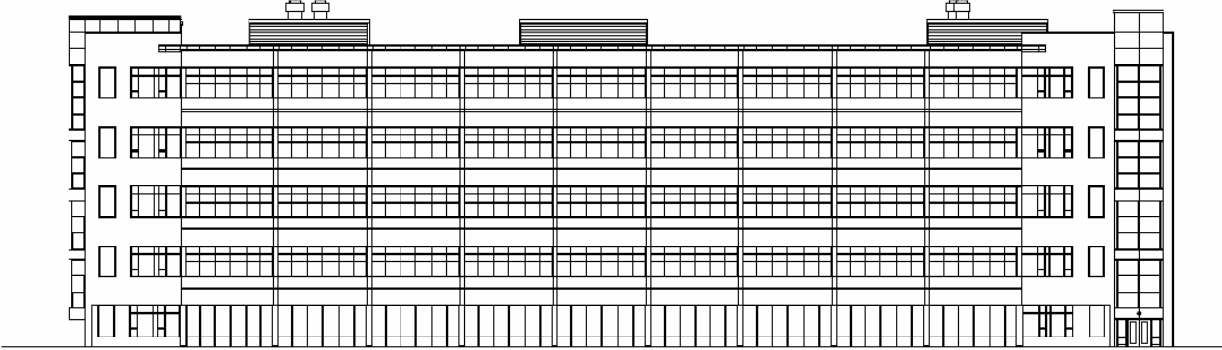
South Elevation of Proposed 5-story Rectangular Wing
